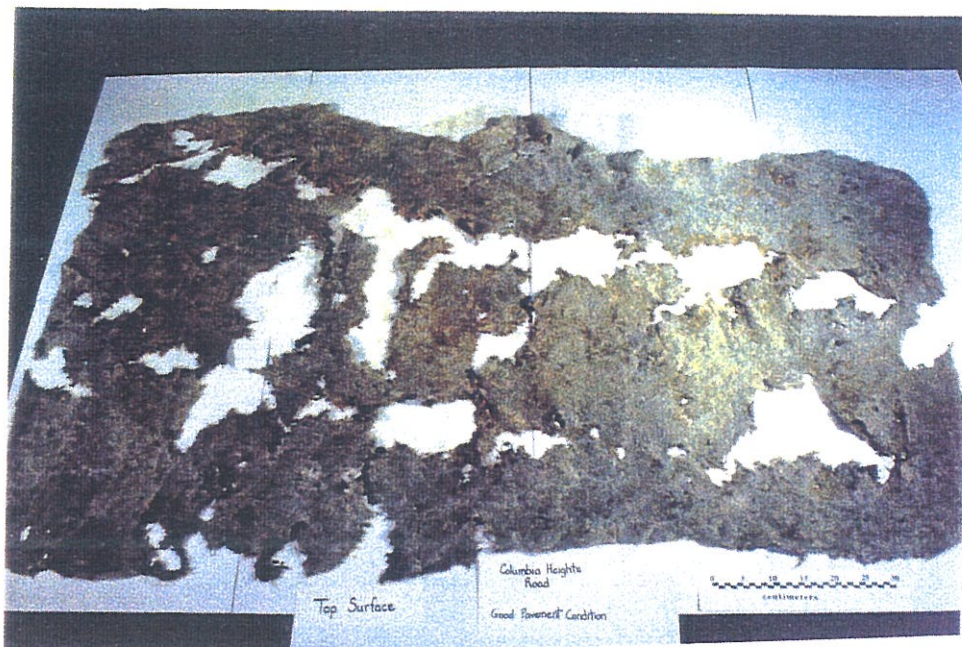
Laboratory photograph of the exhumed geotextile separator, testpit 1.
